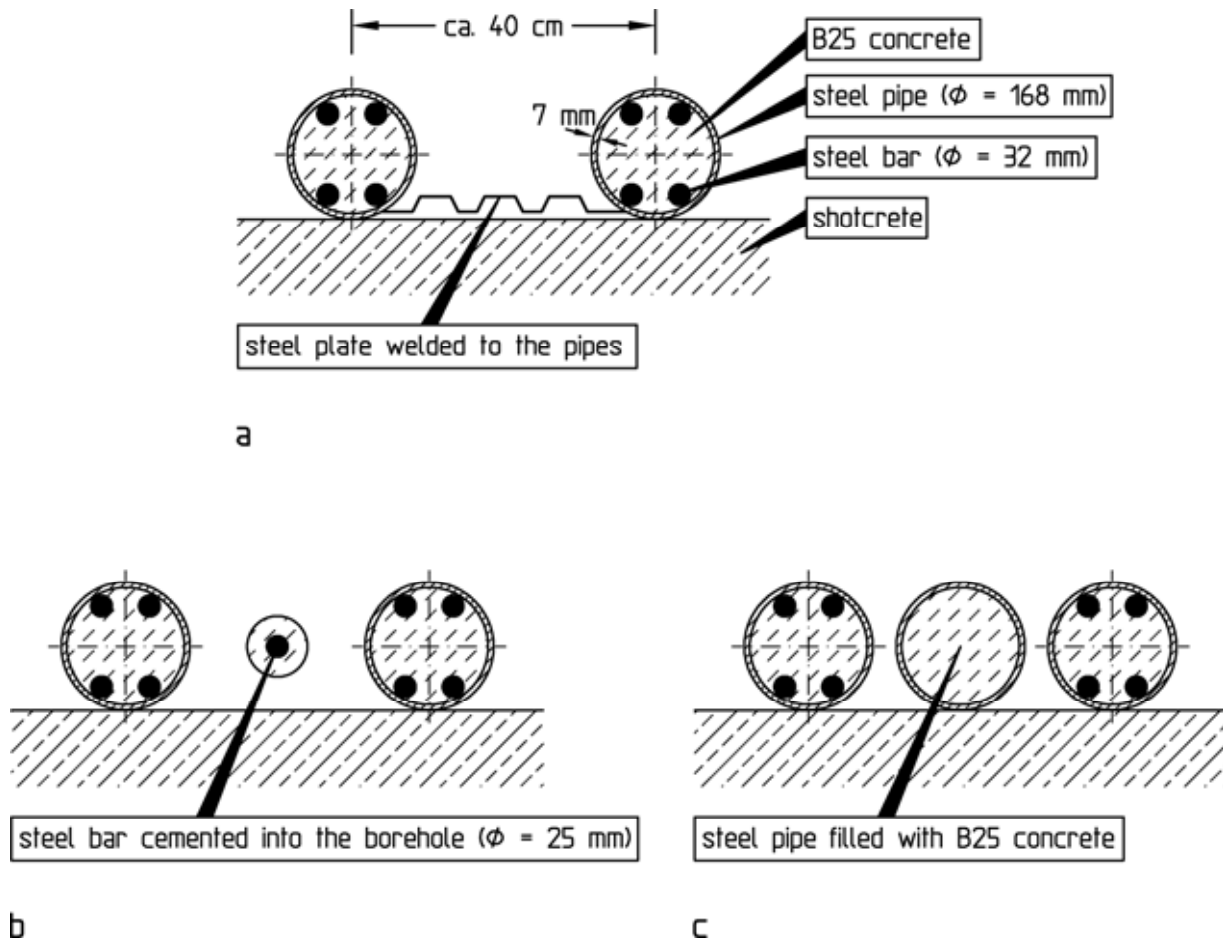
Support of the gaps between the pipes in case of locally occurring dry, loose sand or fill: a) Pipe umbrellas 1 and 2; b) pipe umbrellas 3 to 14; c) pipe umbrellas 15 and 16
